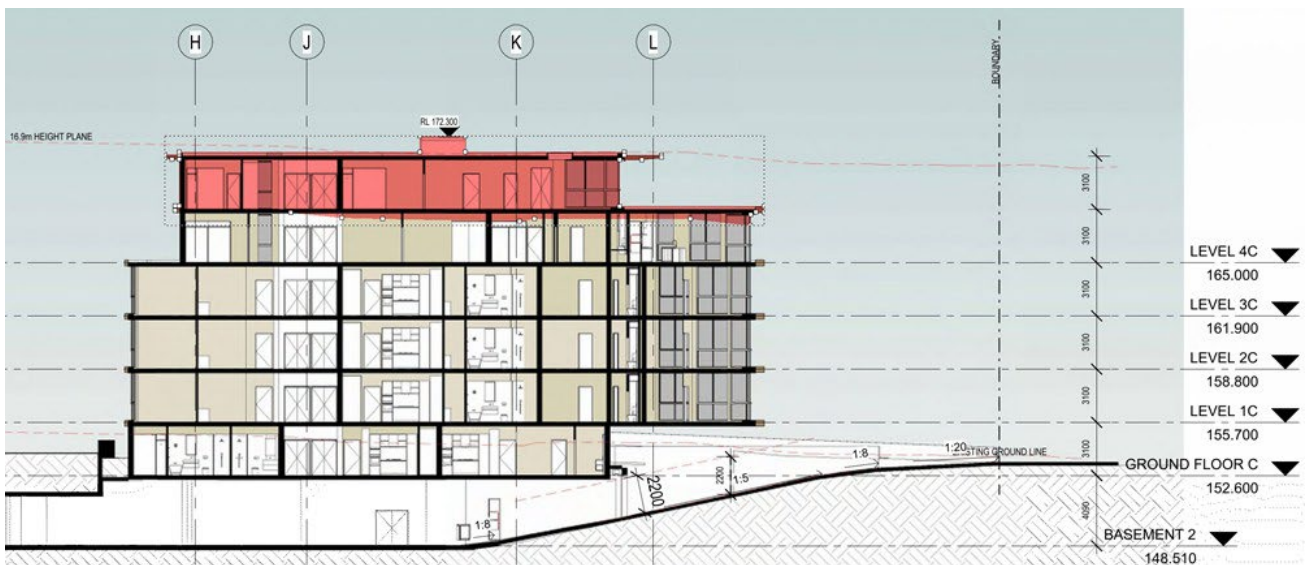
Council calculation of the proposed Building C breach of the WLEP building height standard (shaded red)
